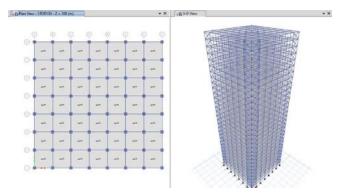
ETABS plan and 3D view of RCC and composite Bracing system
